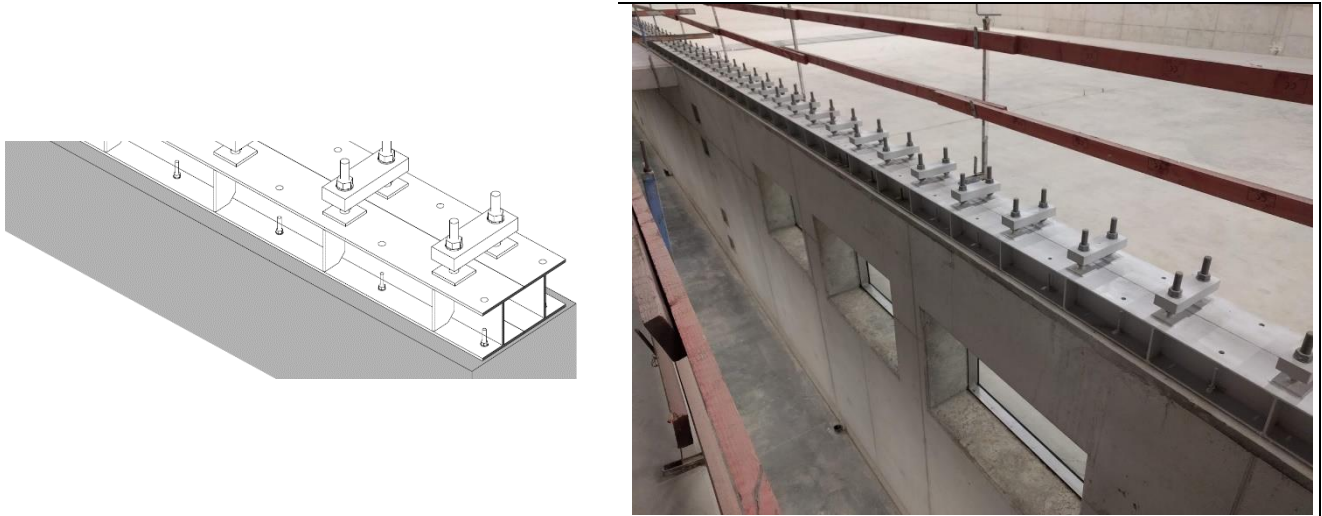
Left: design of the rail support structure. Actual rails not shown. Right: current construction, including view of the side windows.
